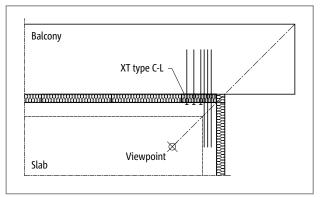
Schöck Isokorb® XT type C: Balcony projecting over corner of building (application XT type C-L)
